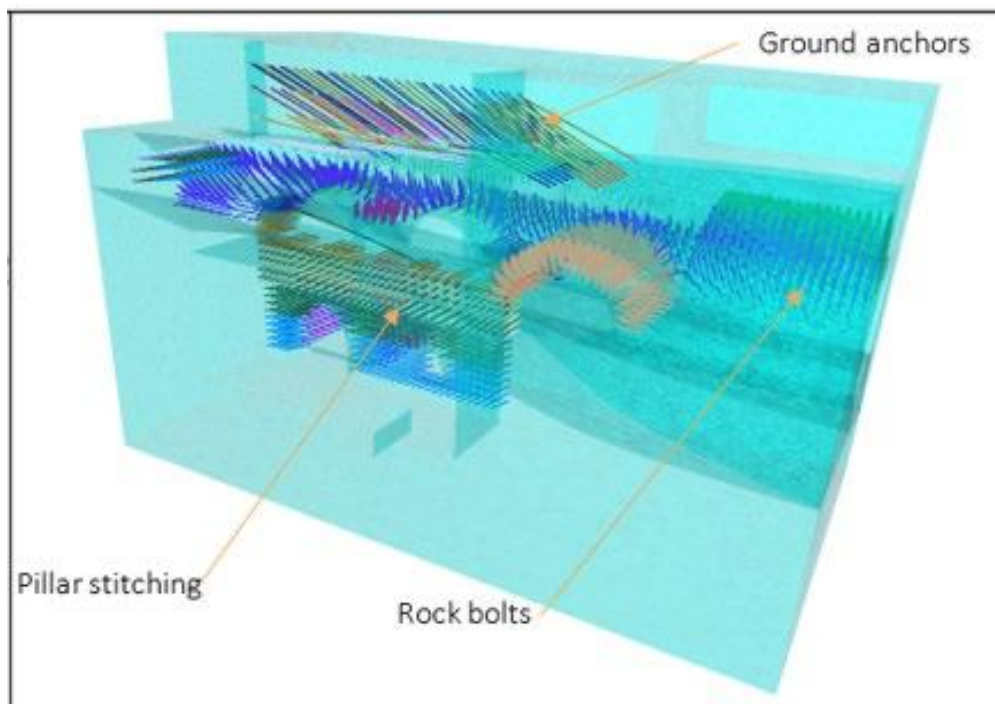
3D model showing the ground support and pillar stitching elements for the Albert Street Station cavern and the Lot 1 shaft.
